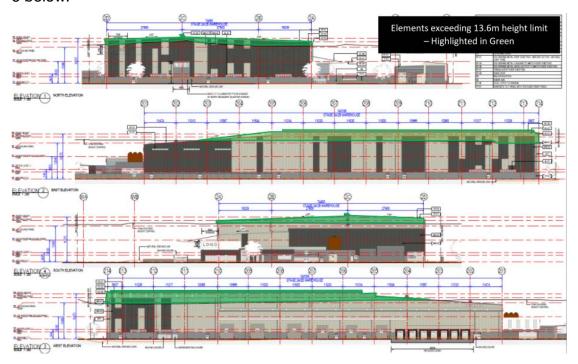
Extent of Building which Exceeds the Height Limit Shown in Green
